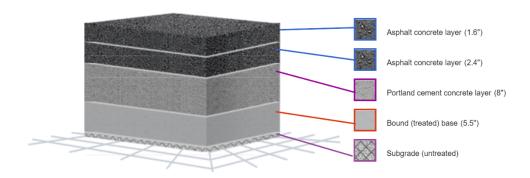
Typical cross-section of a composite test section (Adapted from LTPP InfoPave database)
